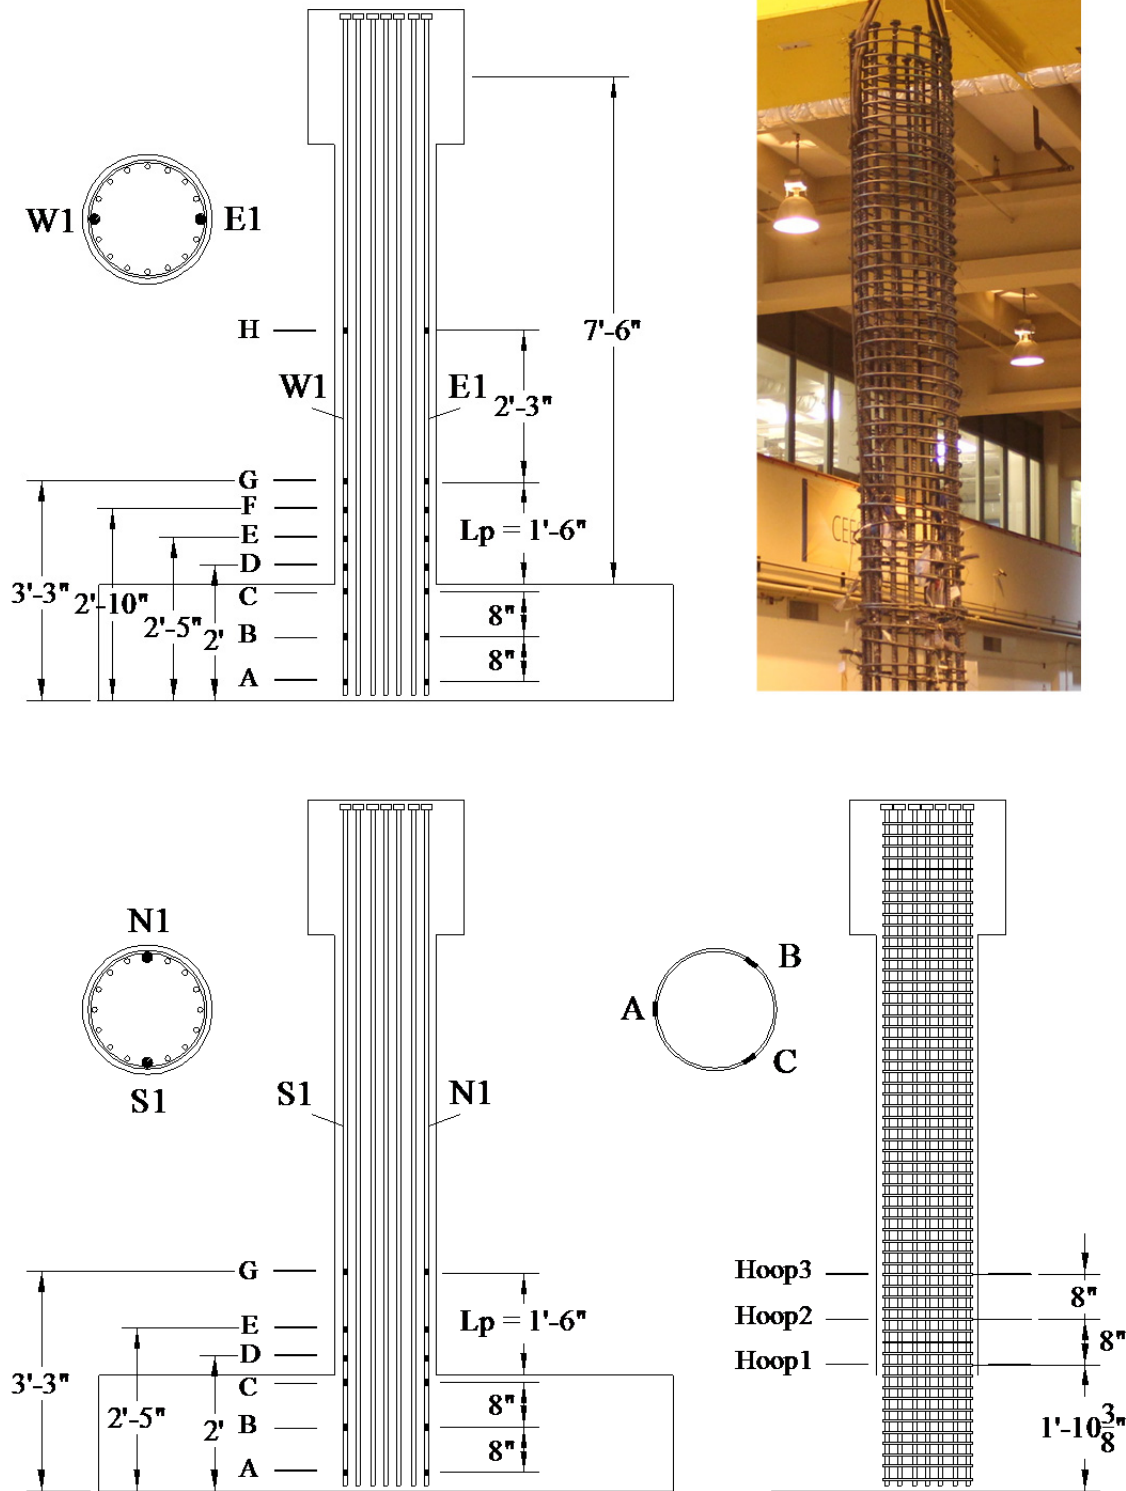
Layout of strain gauges used for the column longitudinal and transverse reinforcement.
